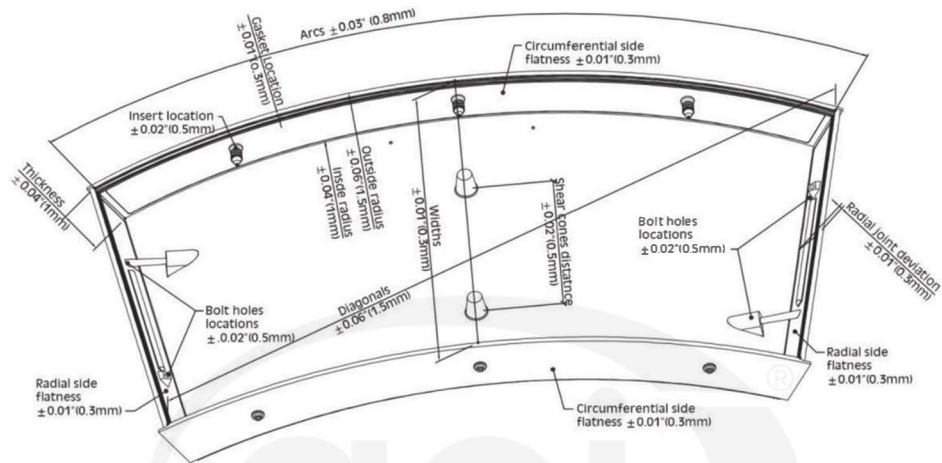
Typical segment formwork tolerances for midsize tunnel projects.
